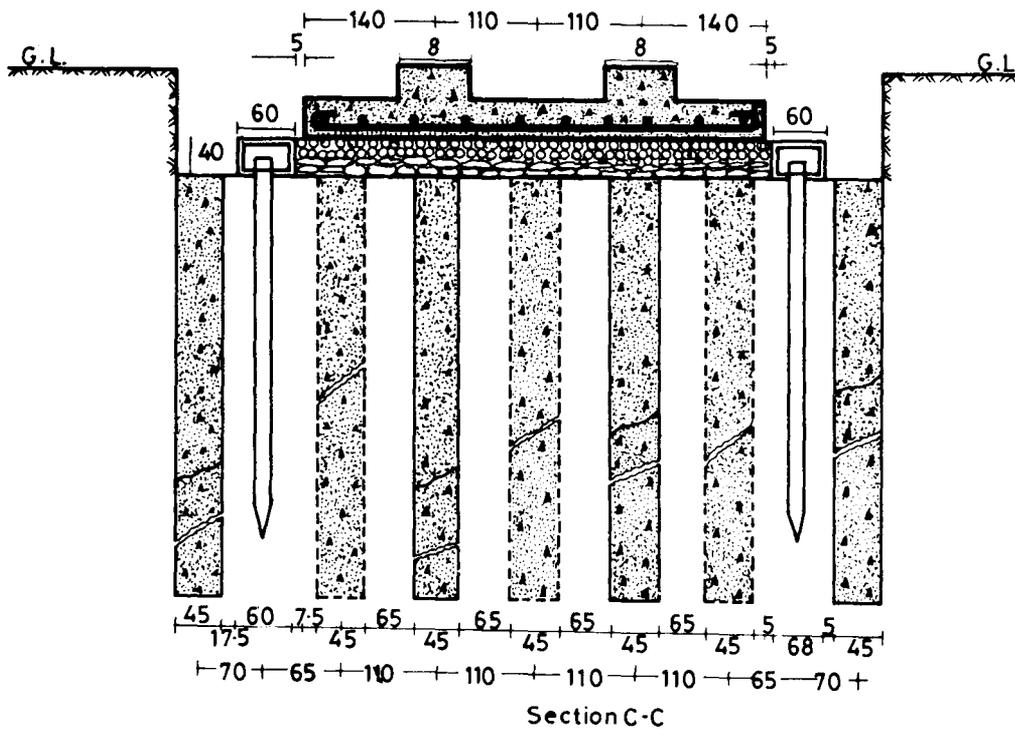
SKIRTED GRANULAR PILE FOUNDATION
